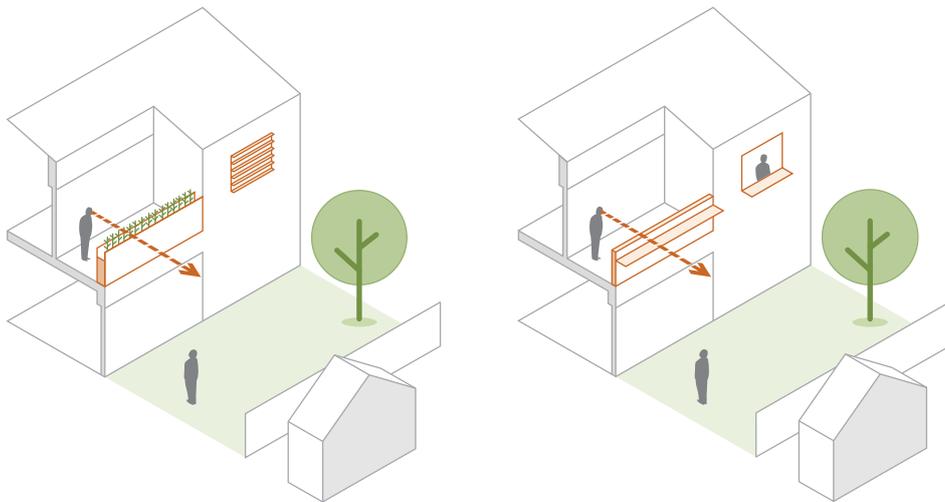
Planter beds and horizontal louvres limit downward views while providing distant views and outlook.
